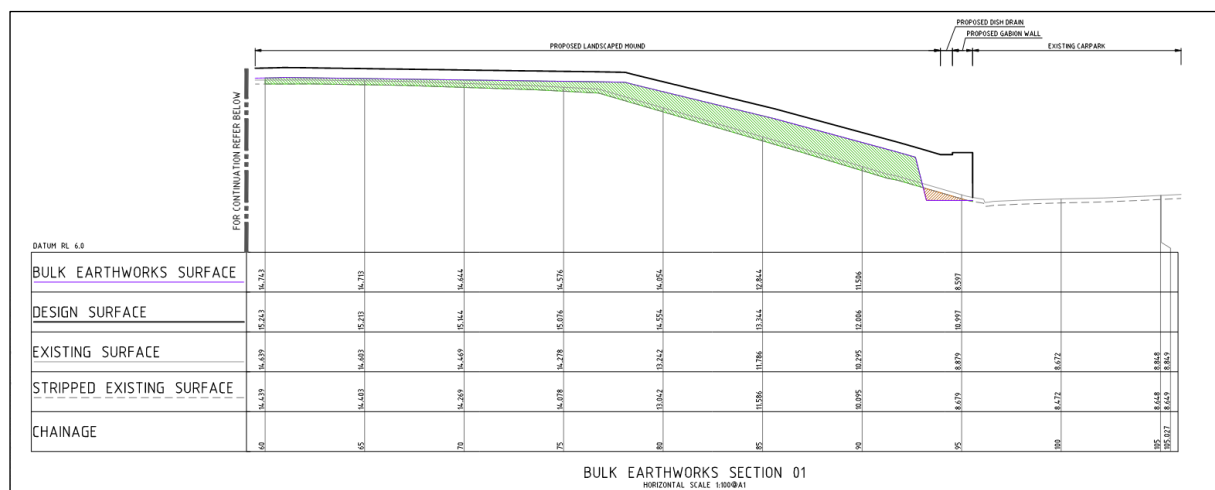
Slope Section of Section-01 At Eastern Side with Toe Retained by Gabion Wall (NORTHROP, 2026)
